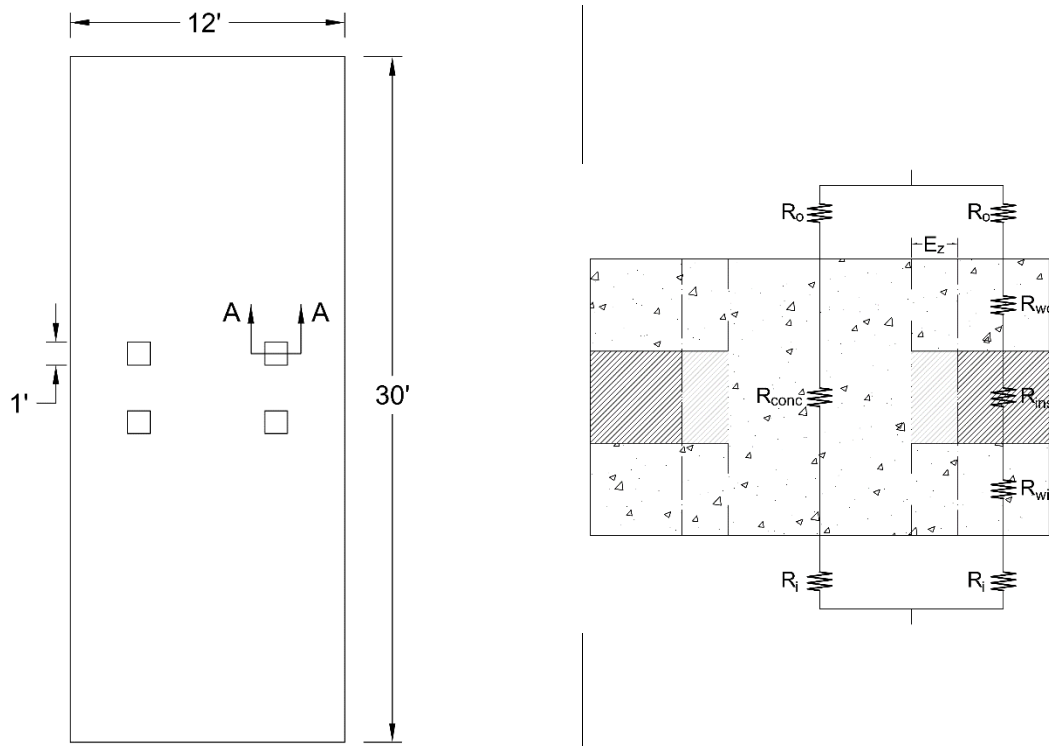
Floor with omitted insulation example panel layout and cross-section with electrical circuit analogy
